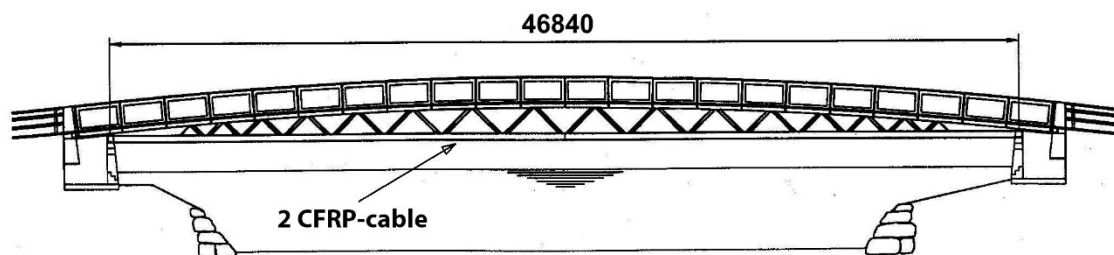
Layout of the bridge “Kleine Emme” with two CFRP-cables under the bridge deck
